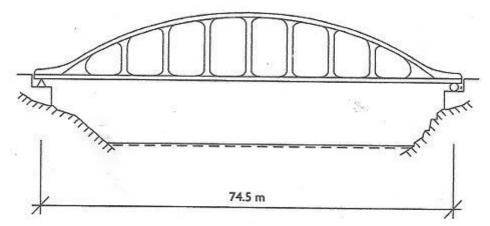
Hasselt Bridge in Profile (Akesson 2008)
